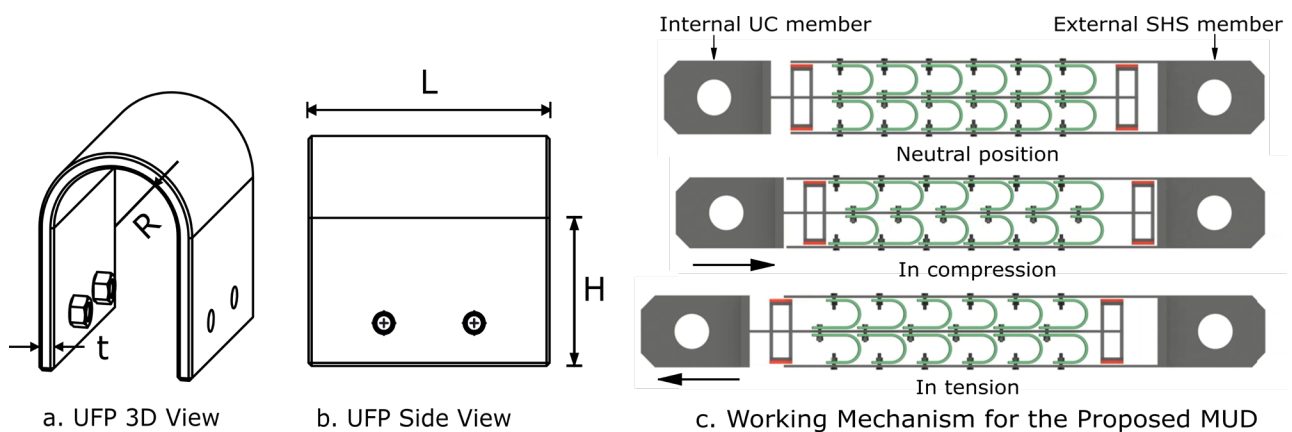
a) UFP 3D view; b) UFP side view; c) Working mechanism for the proposed MUD
